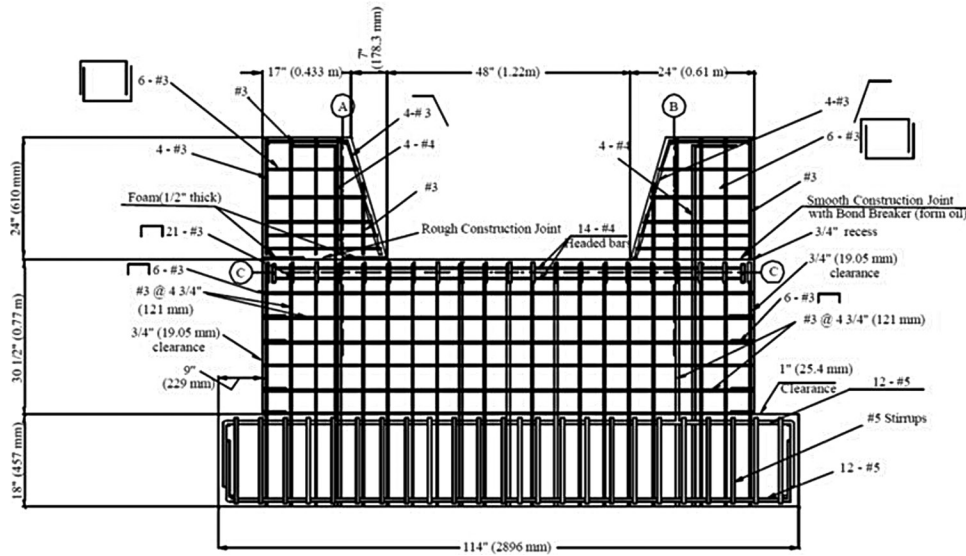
Elevation view of design details for shear key specimen (from Borzozgadeh et al. [2006]).
